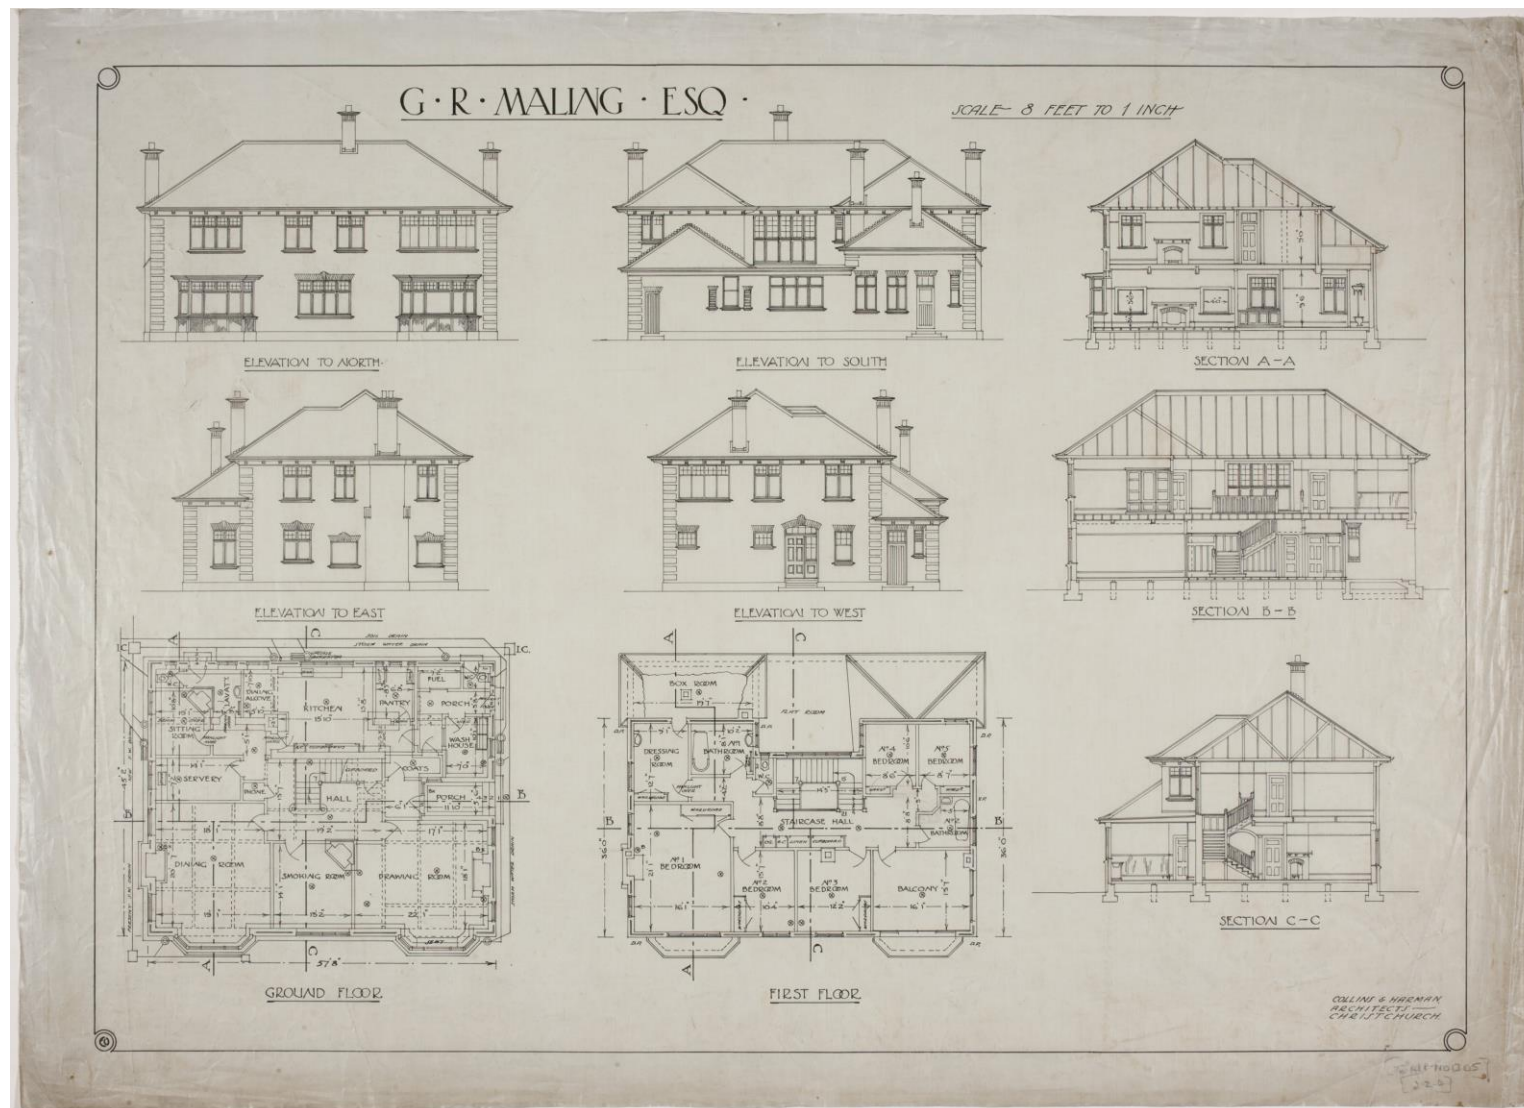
Collins and Harman, G. R. Maling, Esq., plans, elevations and sections (1926)
